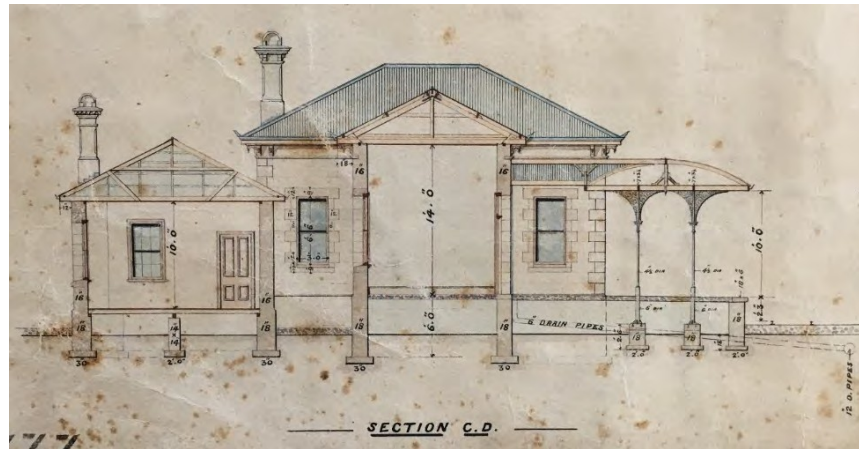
Original section through Porter's room and kitchen wing - extract from drawing dated 25.5.1886. Source: QSA Series 17692 Plans of Queensland Railway Station Buildings etc., Item ID 120966.
